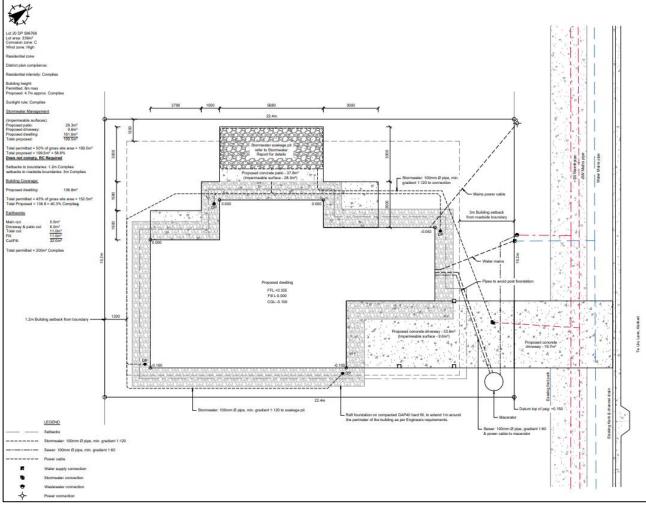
Screenshot of the Site Plan from the supplied architectural drawings.
